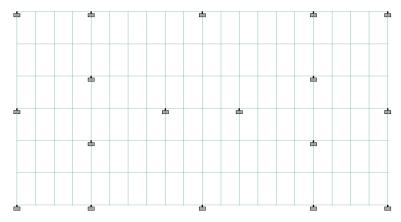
Plan view of Flat plate model with Shear wall in STAAD
